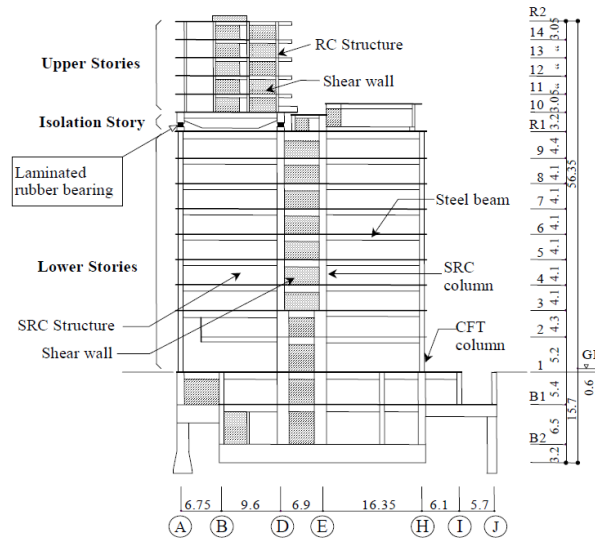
Building Elevation View (Murakami et al. 2008)
